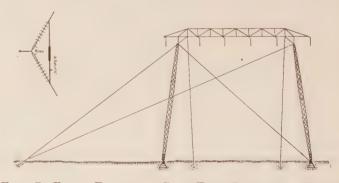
Front Elevation, Post Type Tower for Heavy Angle in Line, Showing Two Pull-offs and Whiffletree
